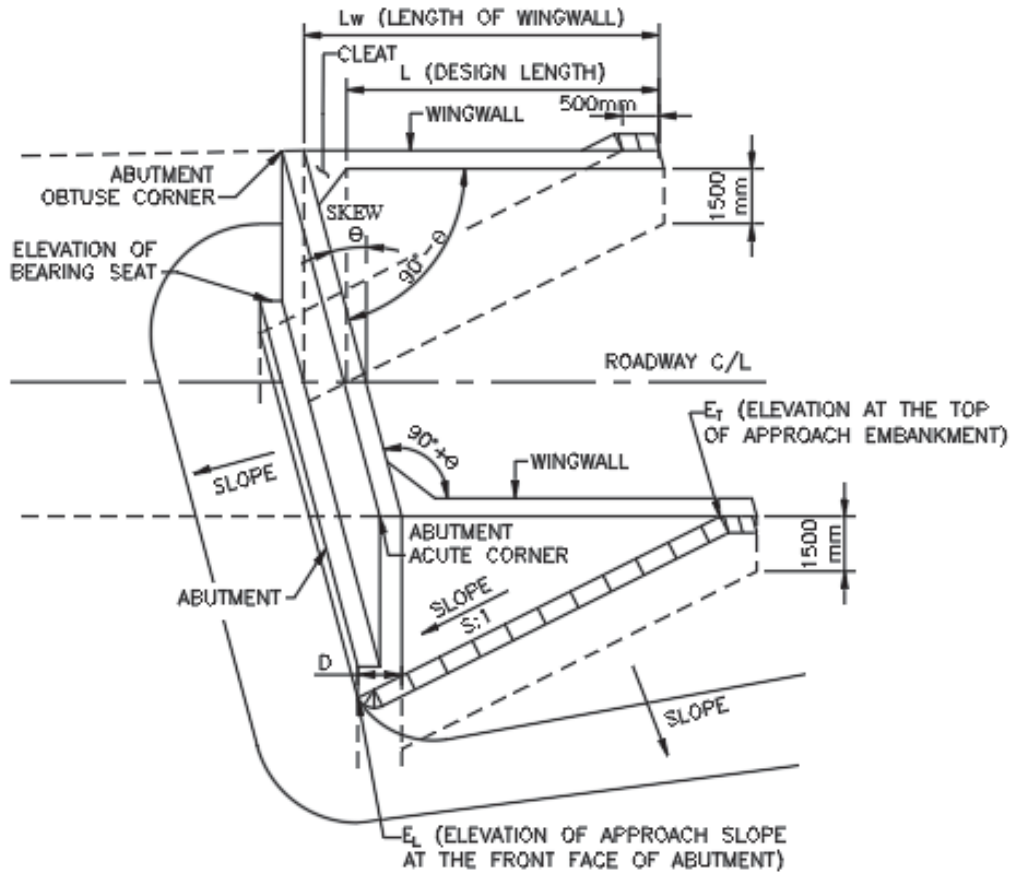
Geometry of U shape bridge wingwall parallel to roadway
